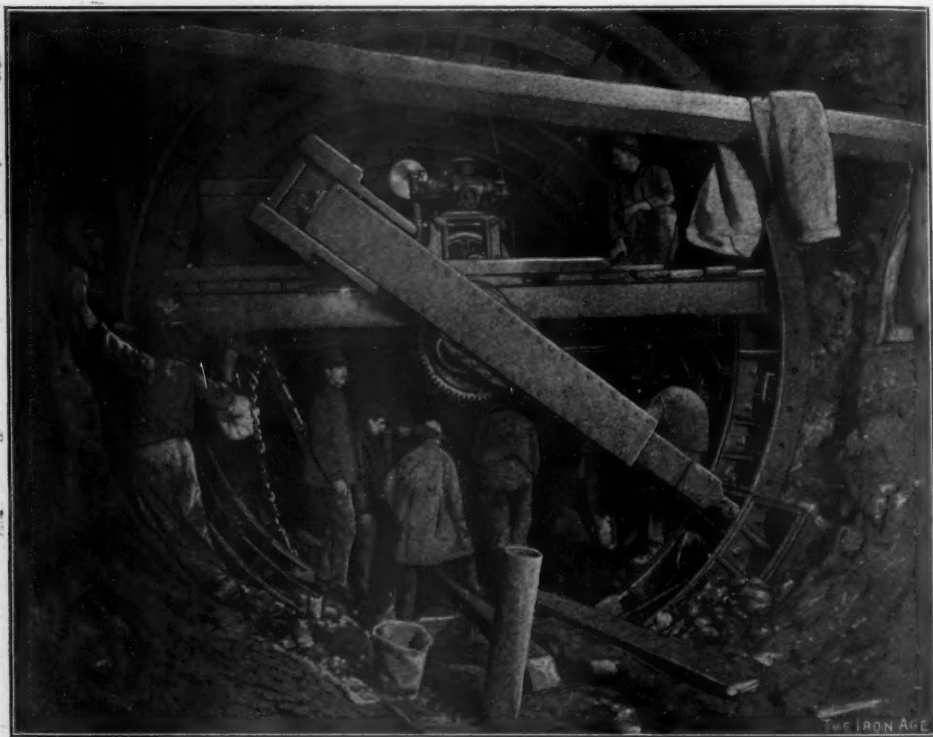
ERECTOR OF PLATES.—NORTH TUNNEL, LOOKING WEST TOWARD ERECTOR, IRON JOINING OLD BRICK WORK, APRIL 19, 1904.
